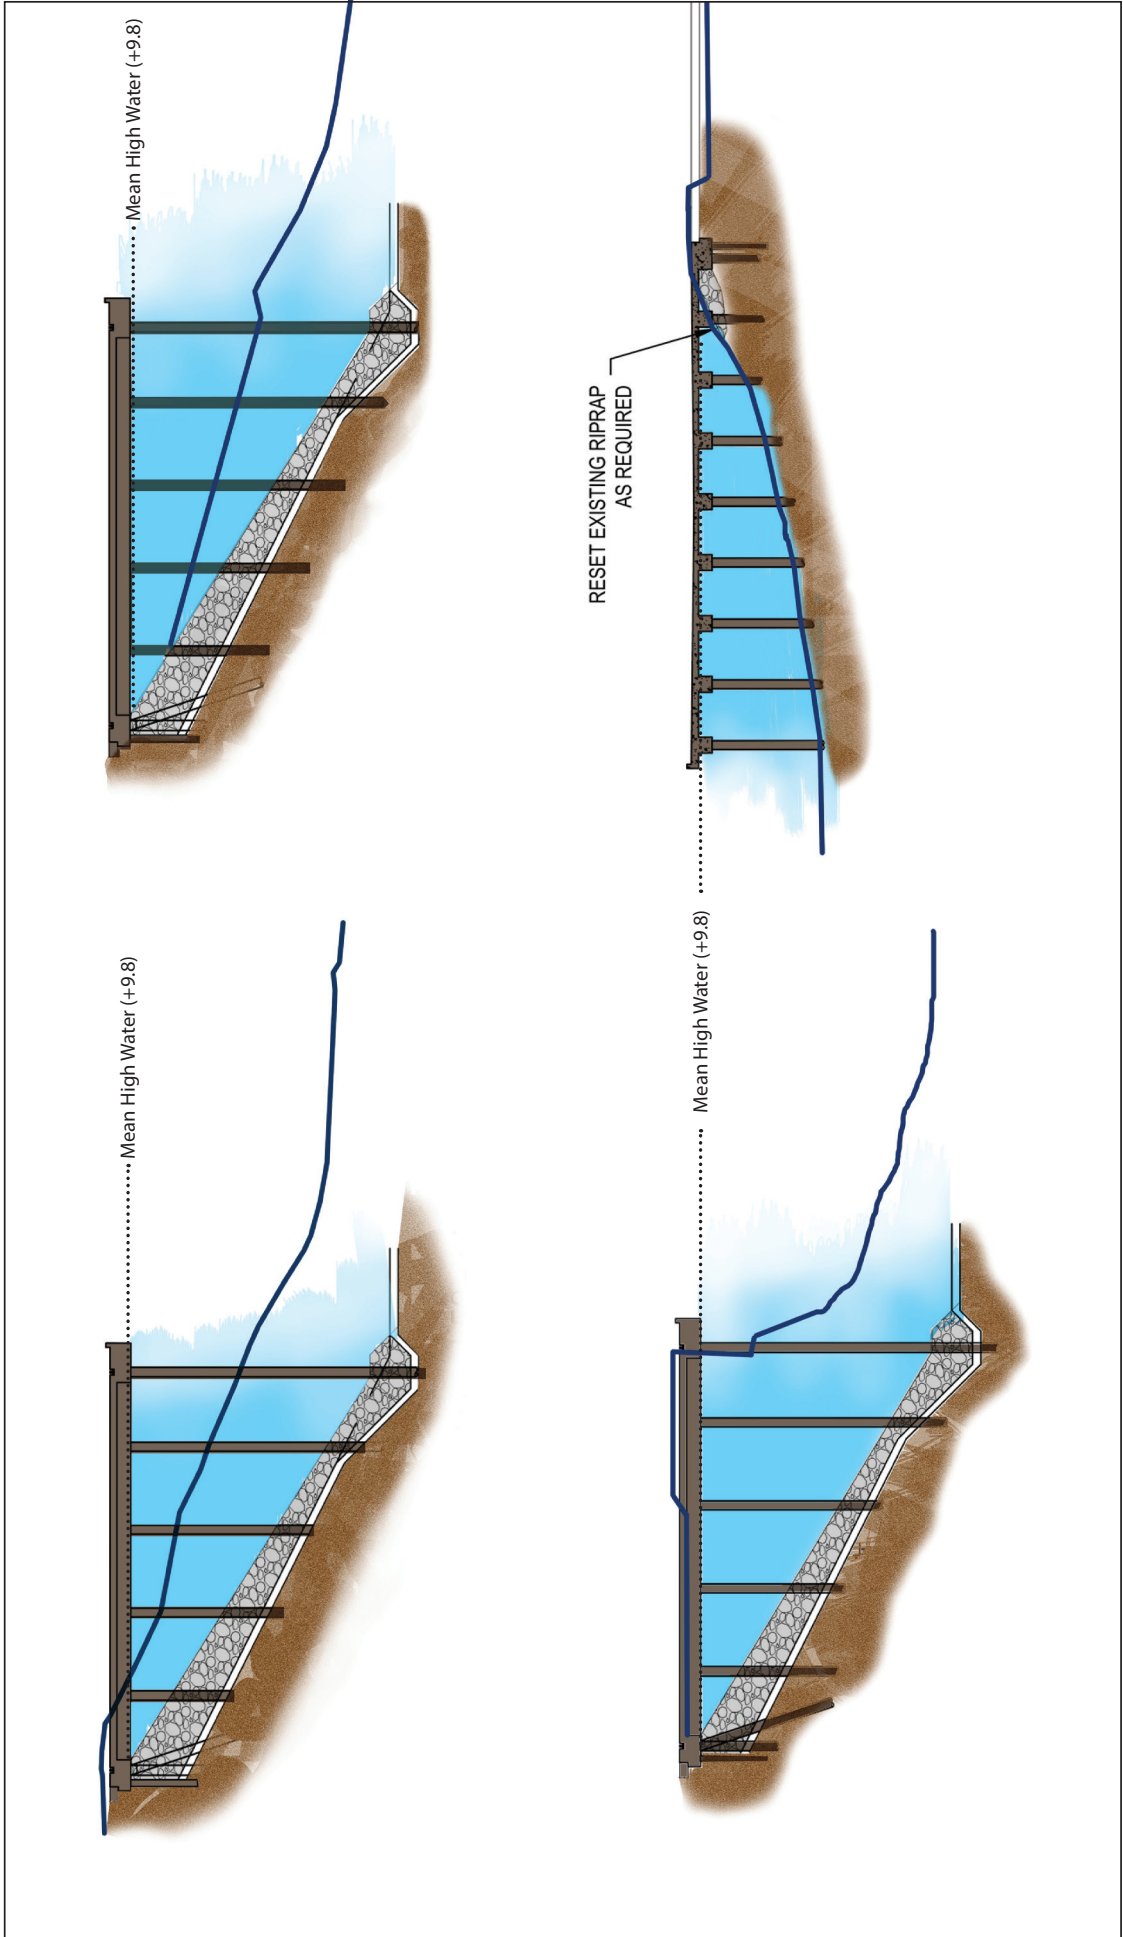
Proposed Berth 10, Typical Cross Sections
